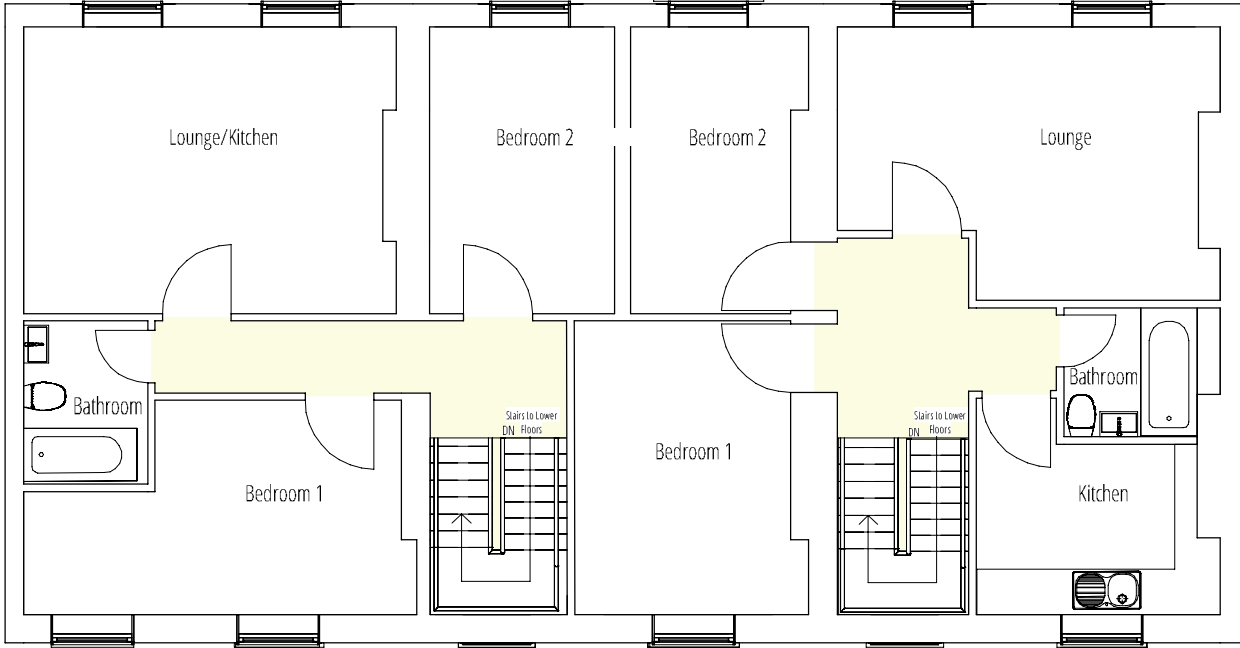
Existing Second Floor Plan Scale 1:100 @A3
